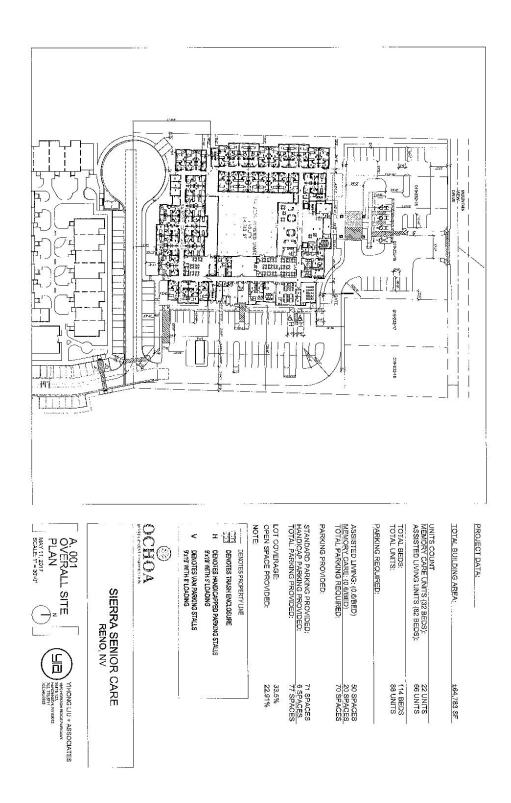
32 BED MEMORY CARE/82 BED ASSISTED LIVING SITE PLAN
